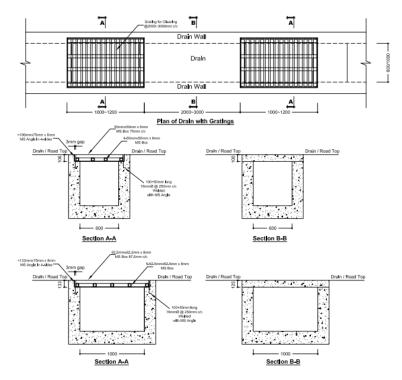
Typical section of steel grating to facilitate cleaning process in cased of closed rectangular drain
